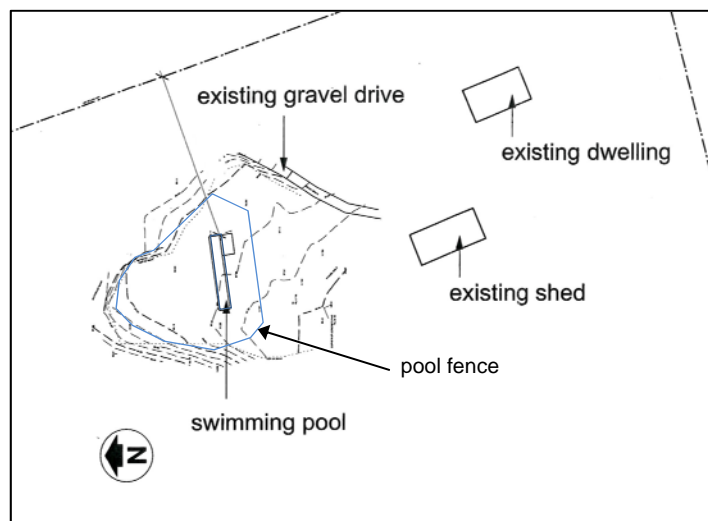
Site plan showing existing structures & location of pool and barrier (Not to scale)
